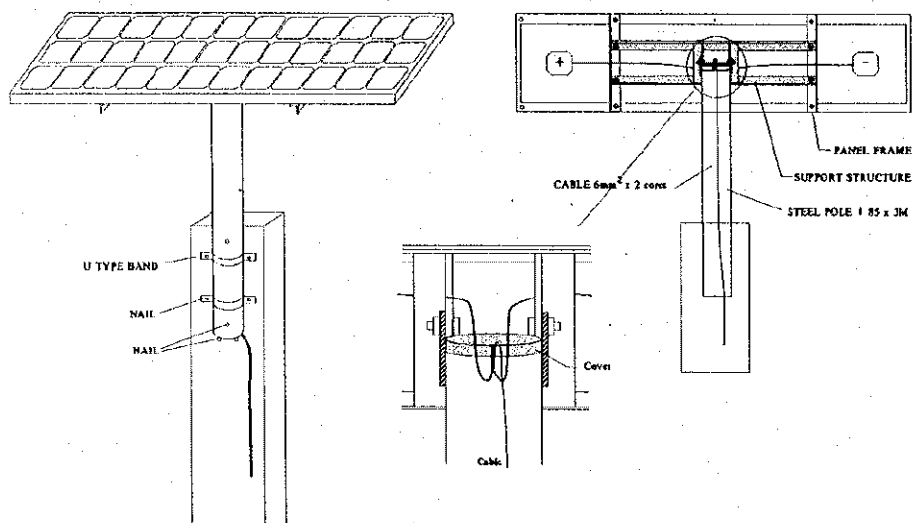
Drawing of PV array mounted (Roof pole type)
